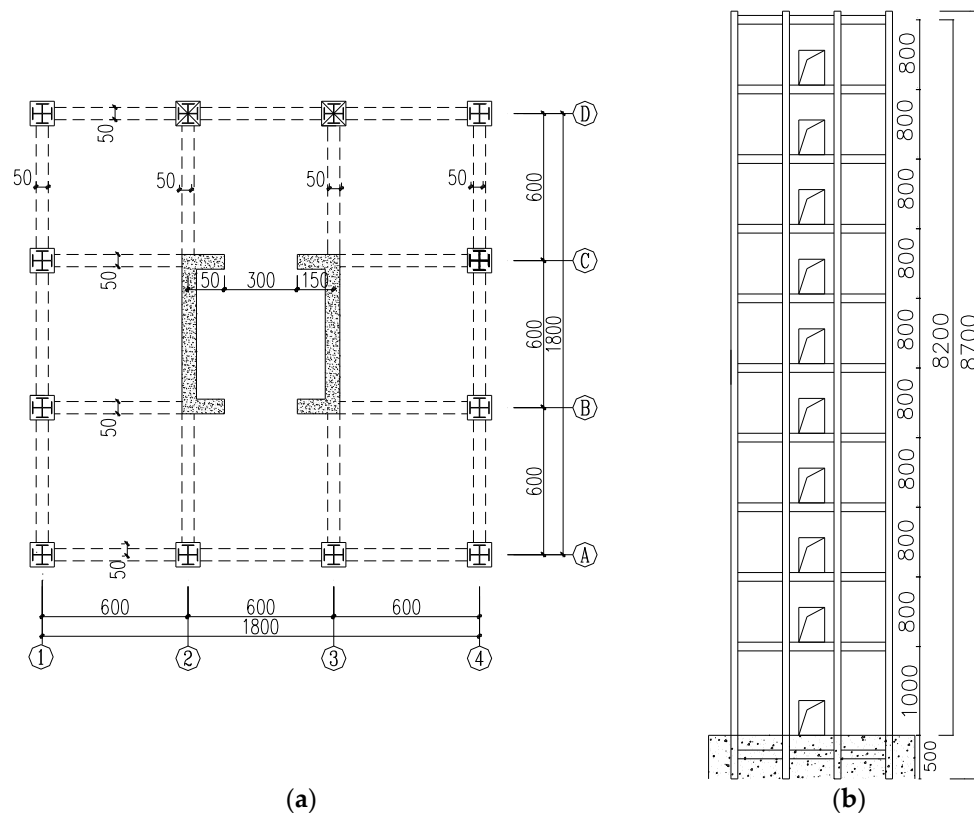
Dimension of specimen: (a) cross section; (b) elevation (unit: mm).
